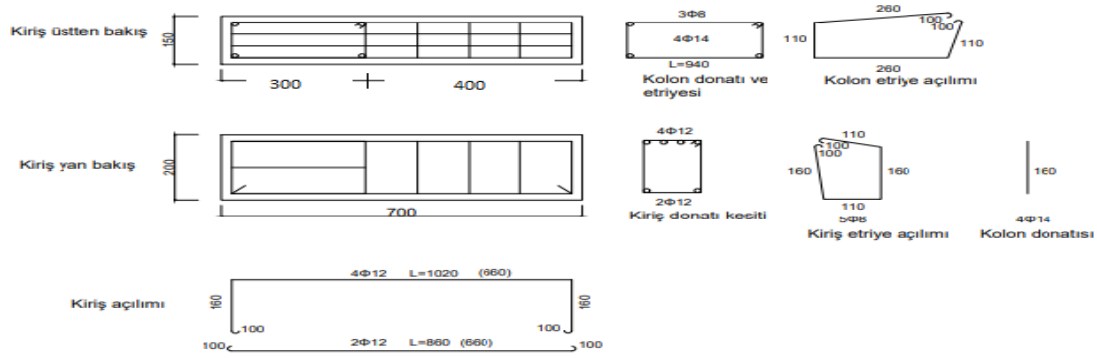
Cantilever beam expansions with unbalanced reinforcement (lengths in mm)
